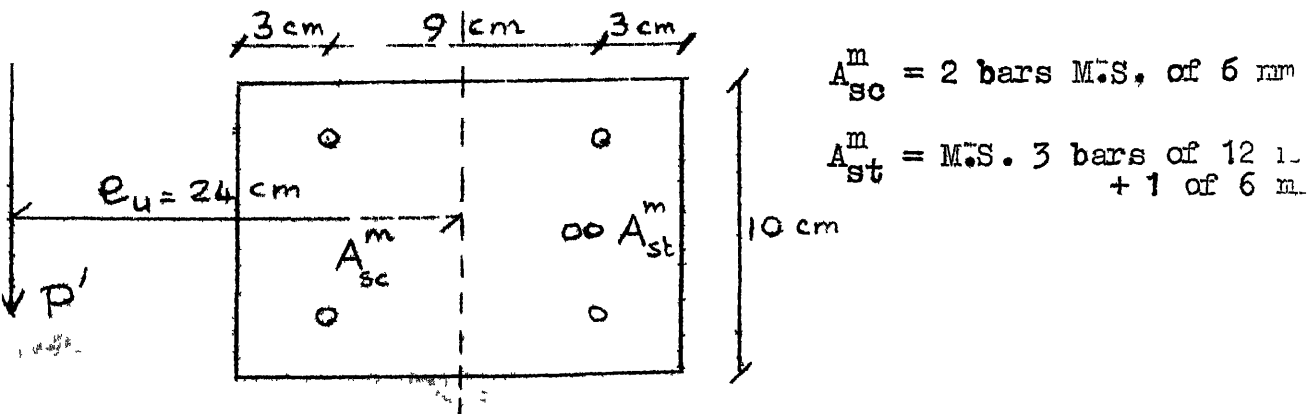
DETAILS OF JOINT SECTION ON COLUMN SIDE
